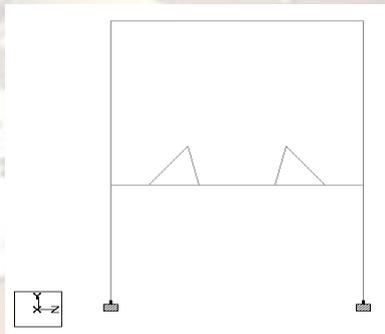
D View of a Building Structure Model for Looms Industry in Y-Z Plane in STAAD.Pro
